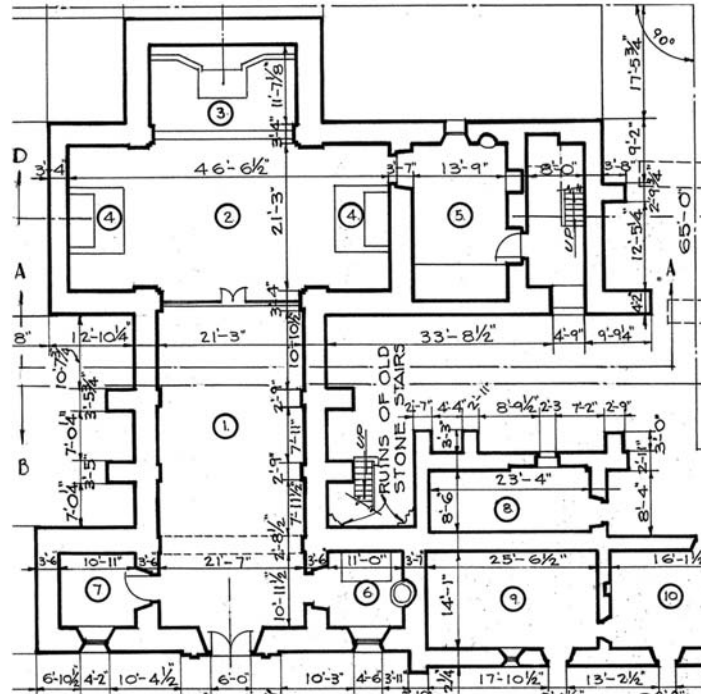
Floor plan of 'Mission Concepcion church' (Photo courtesy: <https://www.loc.gov/pictures/collection/hh/item/tx0038/>)
